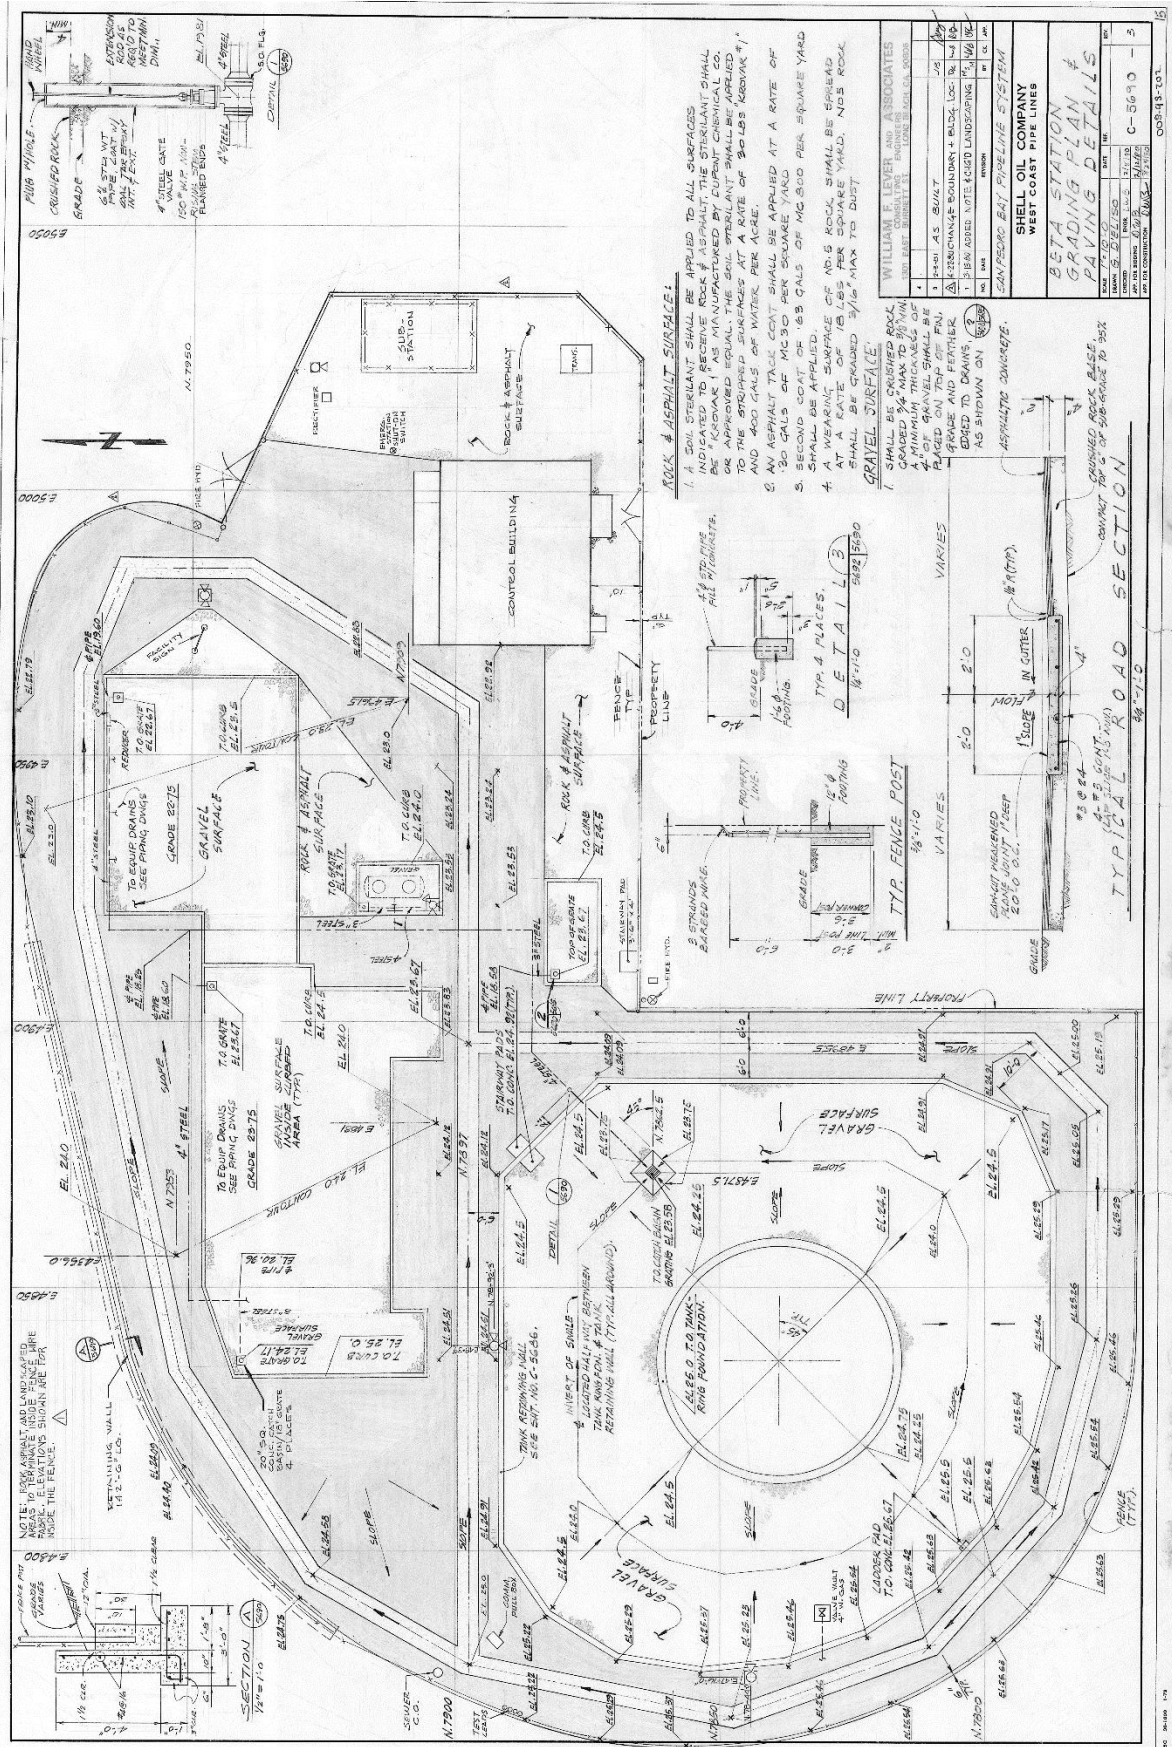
Beta Pump Station Piping and Curbing Location Plan
